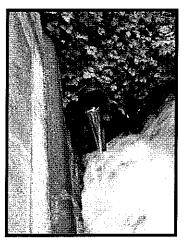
Confirmation of Surface Water Outfall Point at Primrose Bridge, Whalley Road
